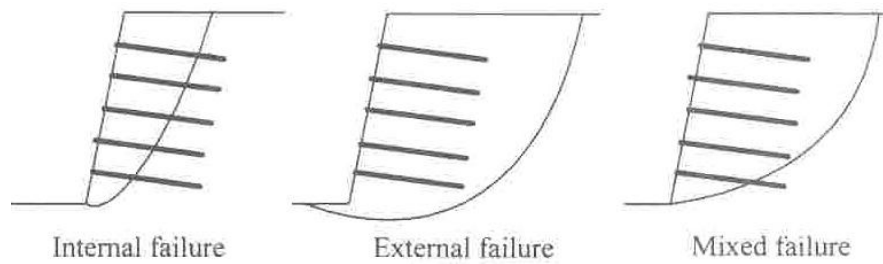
Possible mechanisms of failure of an excavation with the technique of reinforced soil nailing
